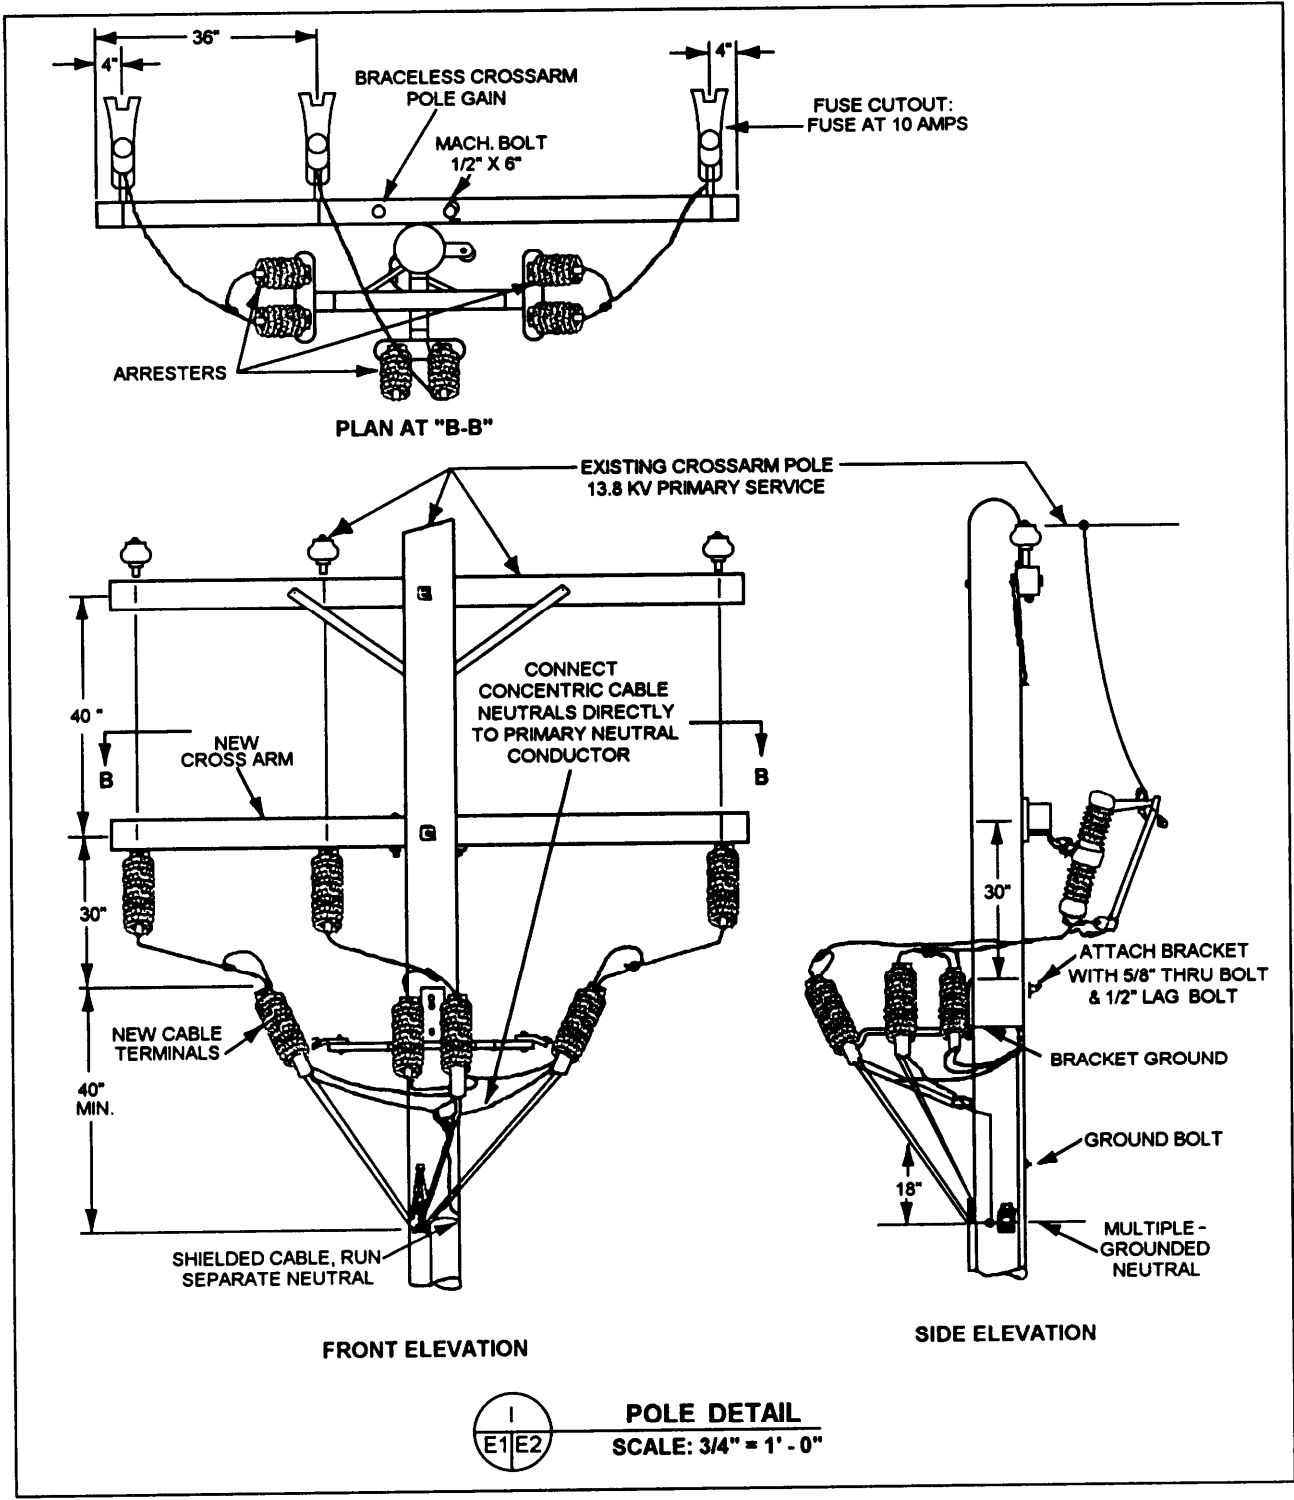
Pole detail for use with the site plan shown in figure 2-15.
